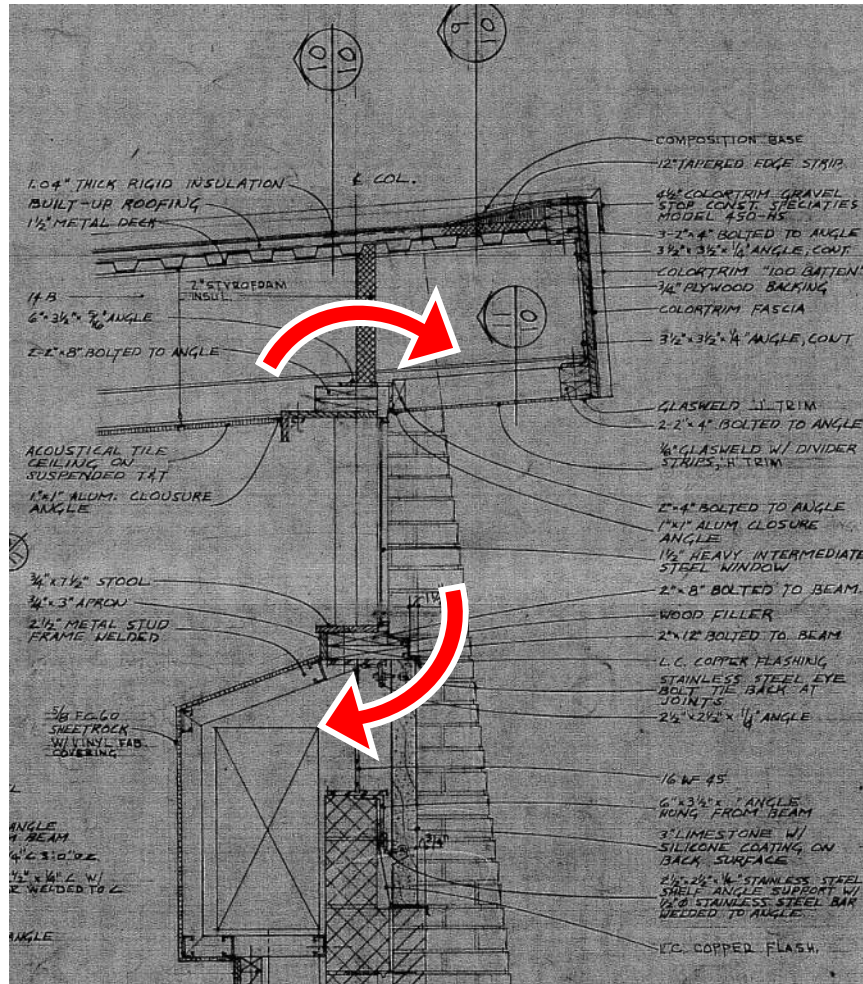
Exterior facing wall section at Room 26. Section referenced from Detail 5/10 of the 1968 Drawings.
